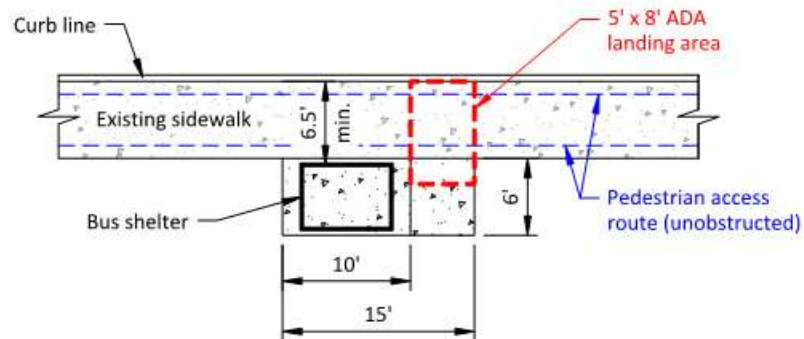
Separated Sidewalk with Rear Door Landing Area
